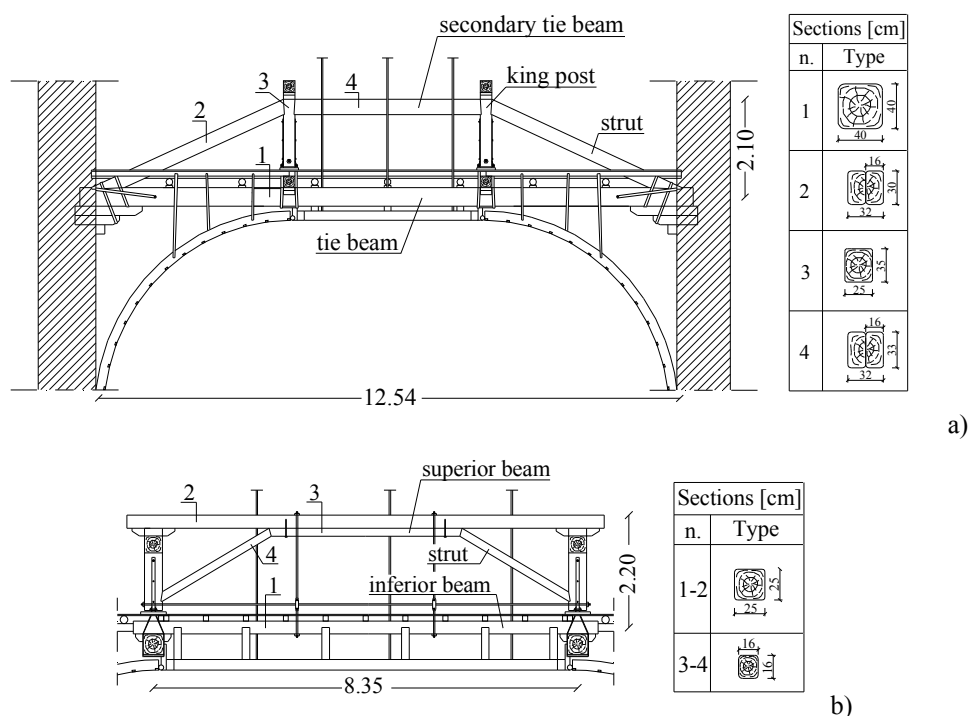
Guard Room (XXIX) – Geometrical survey – Vault supporting structure [m]:
